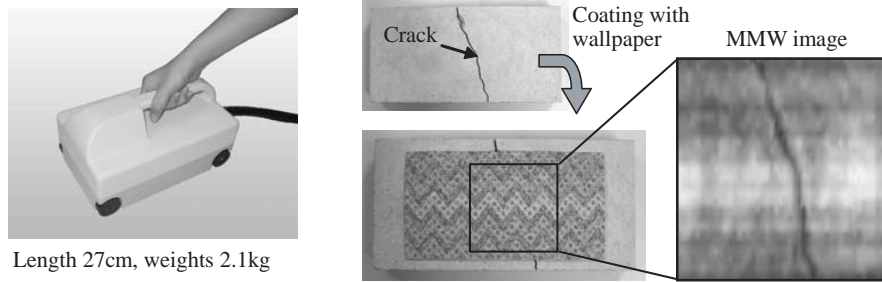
Photograph of Crack Scan and a result of crack detection under wallpaper.
